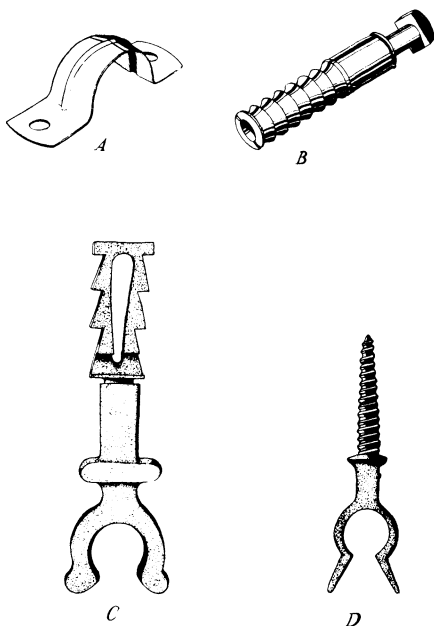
Conductor fasteners include (A) pipe strap, (B) masonry anchor, (C) masonry anchor, and (D) screw fastener.
